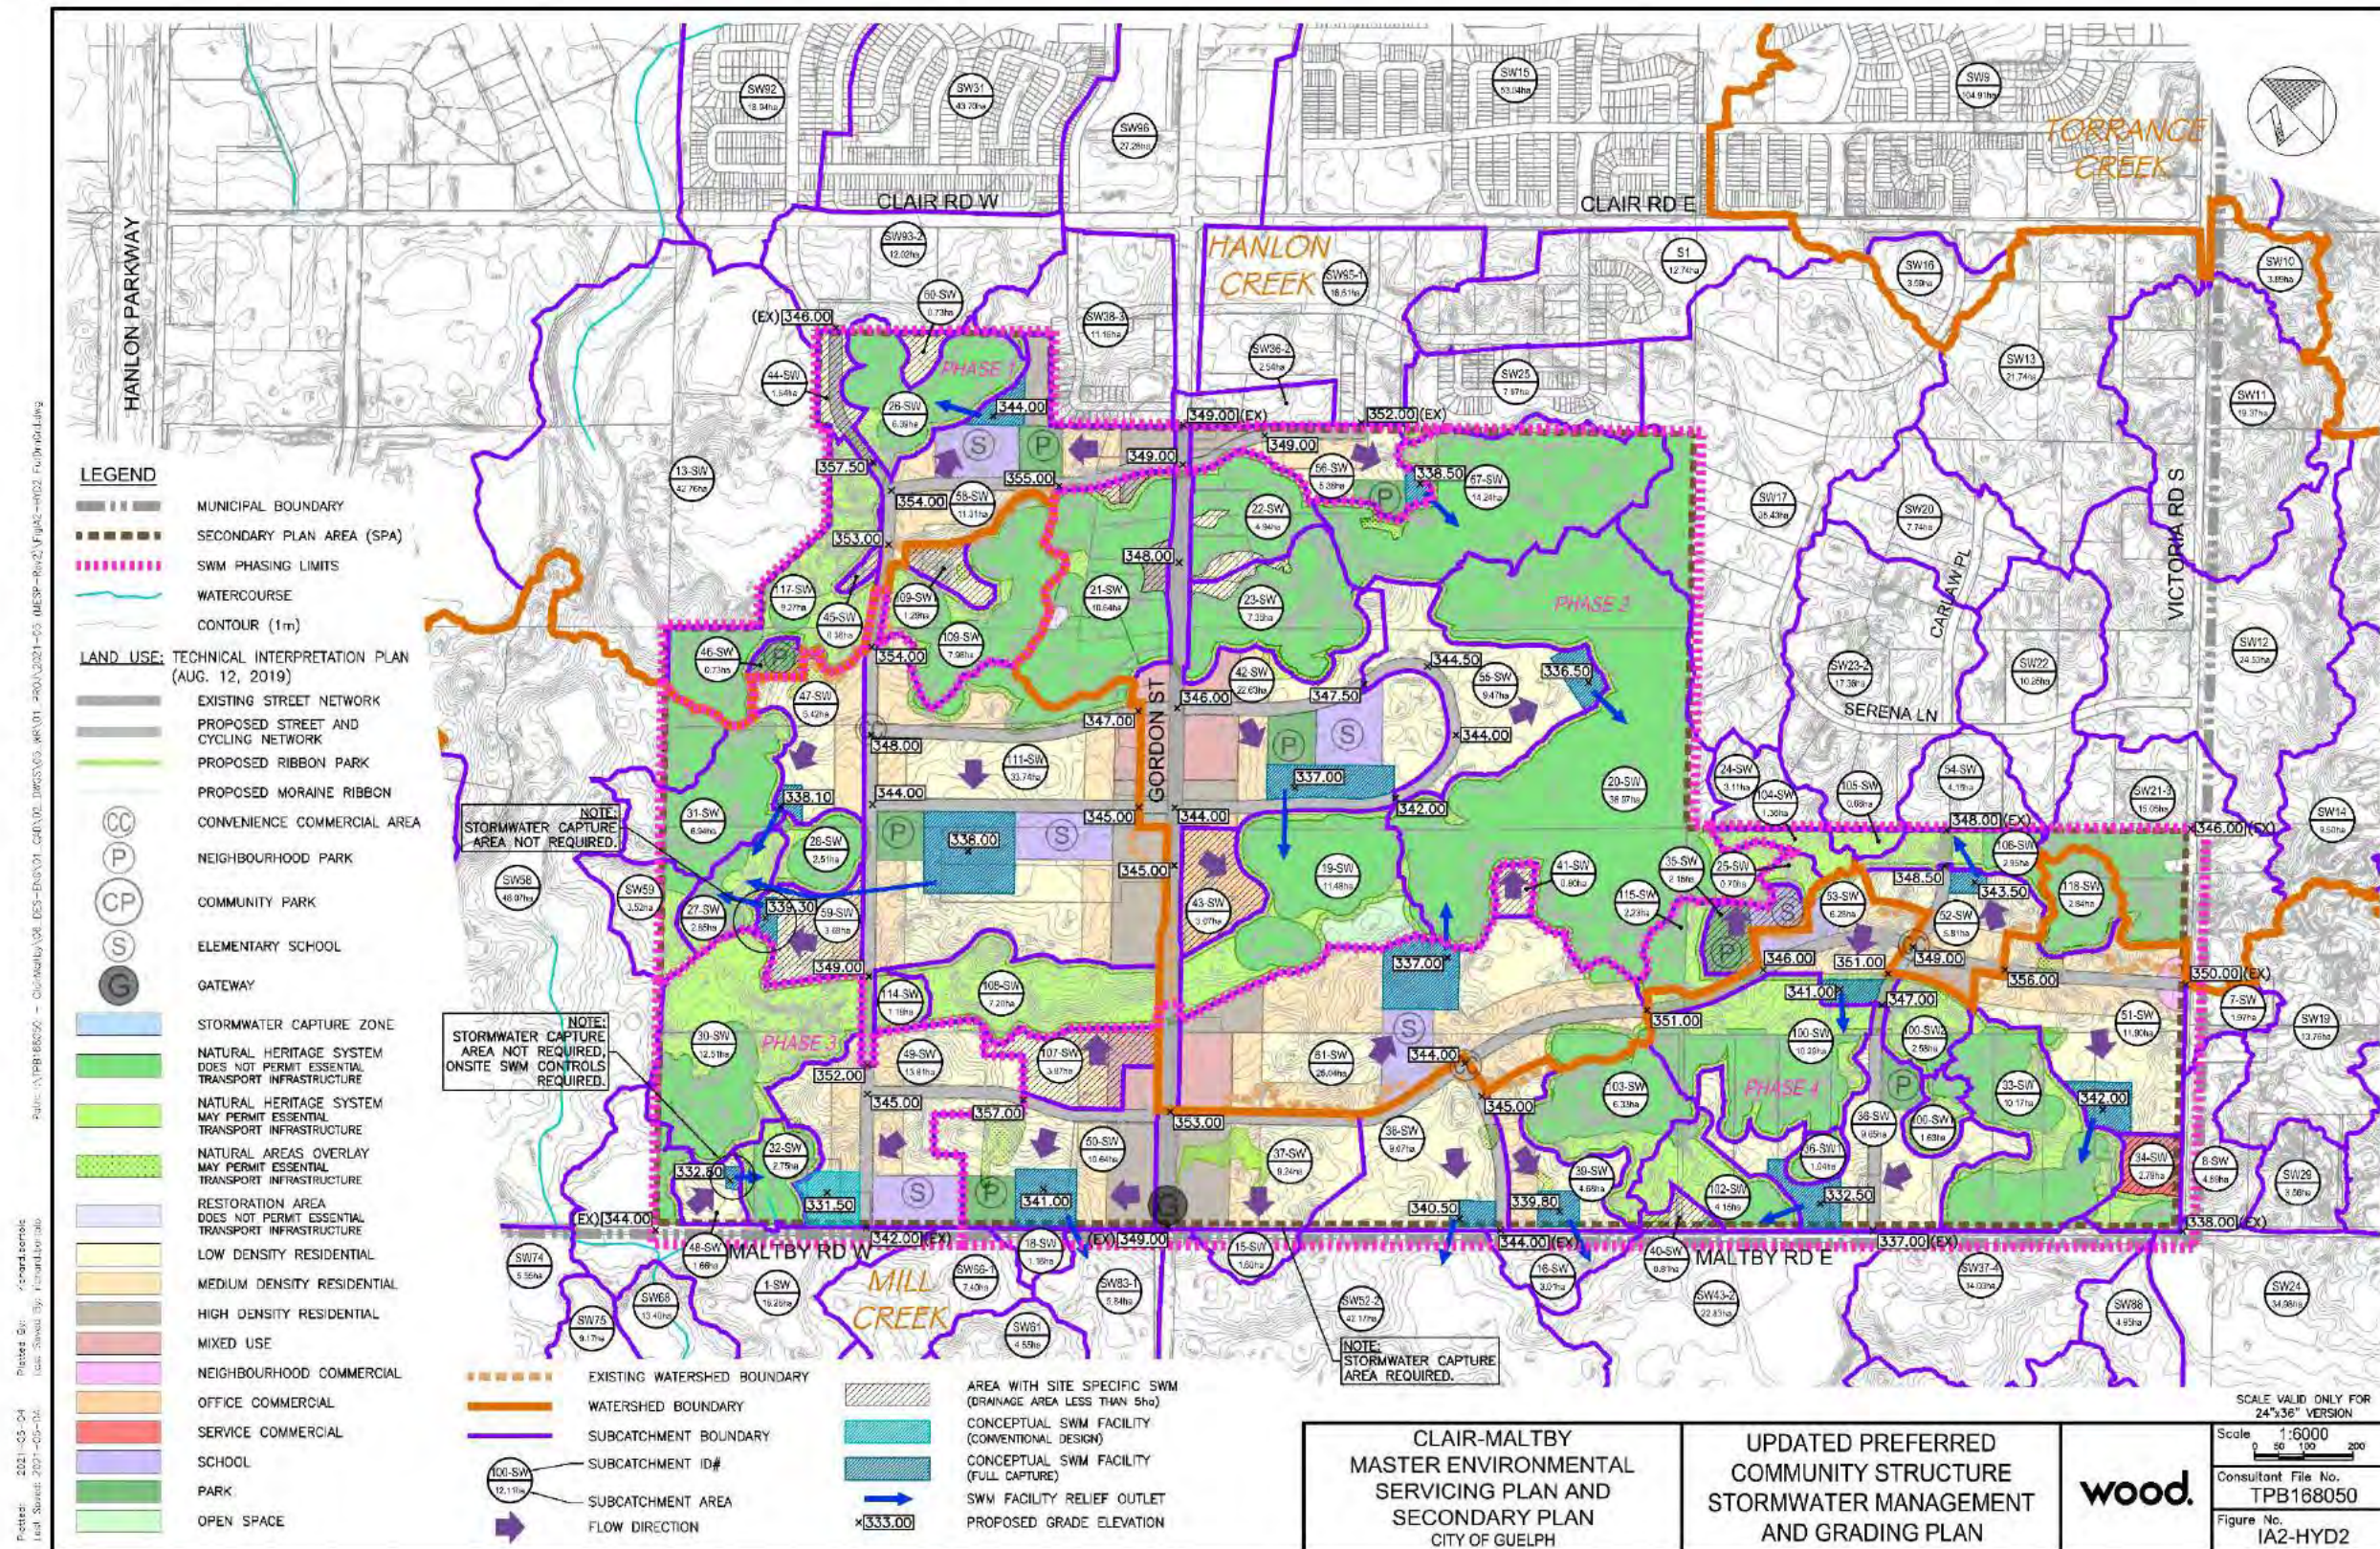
Preliminary Stormwater Management and Conceptual Grading Plan
